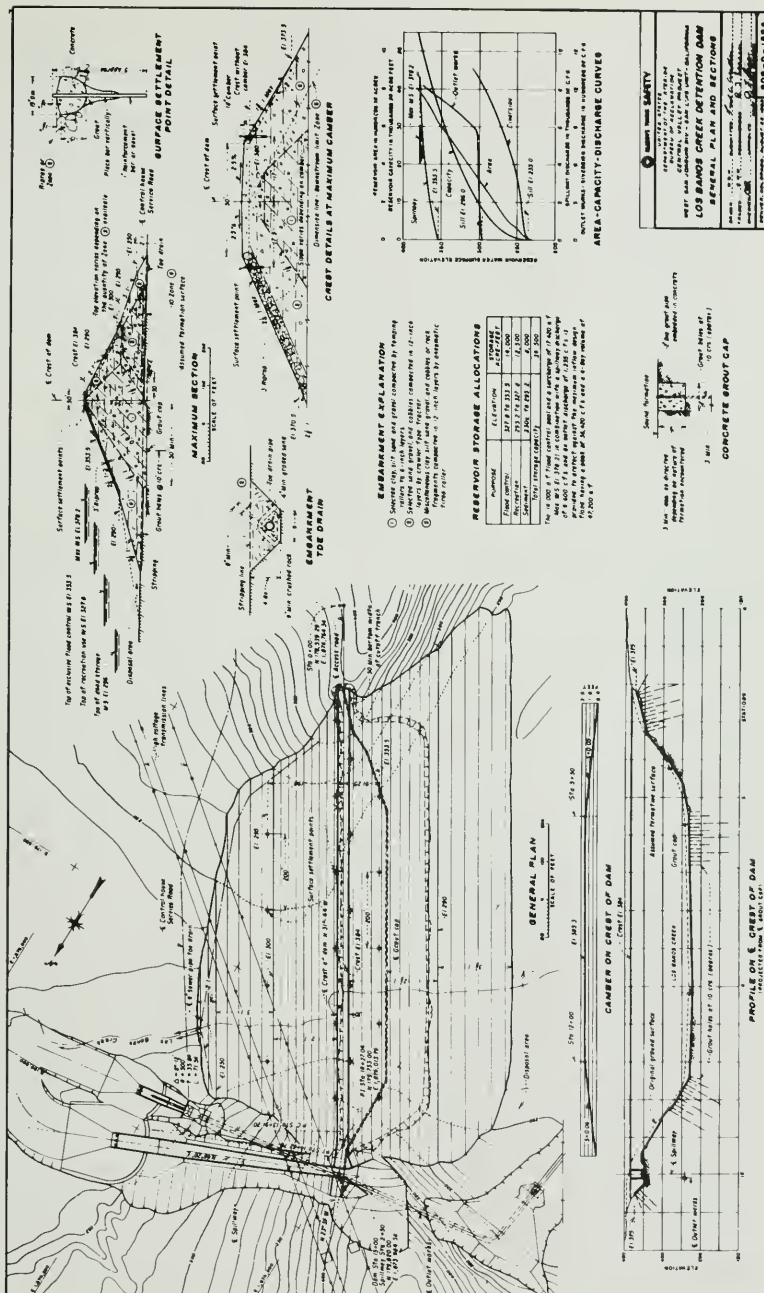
Los Banos Detention Dam—Plan, Profile, and Sections
